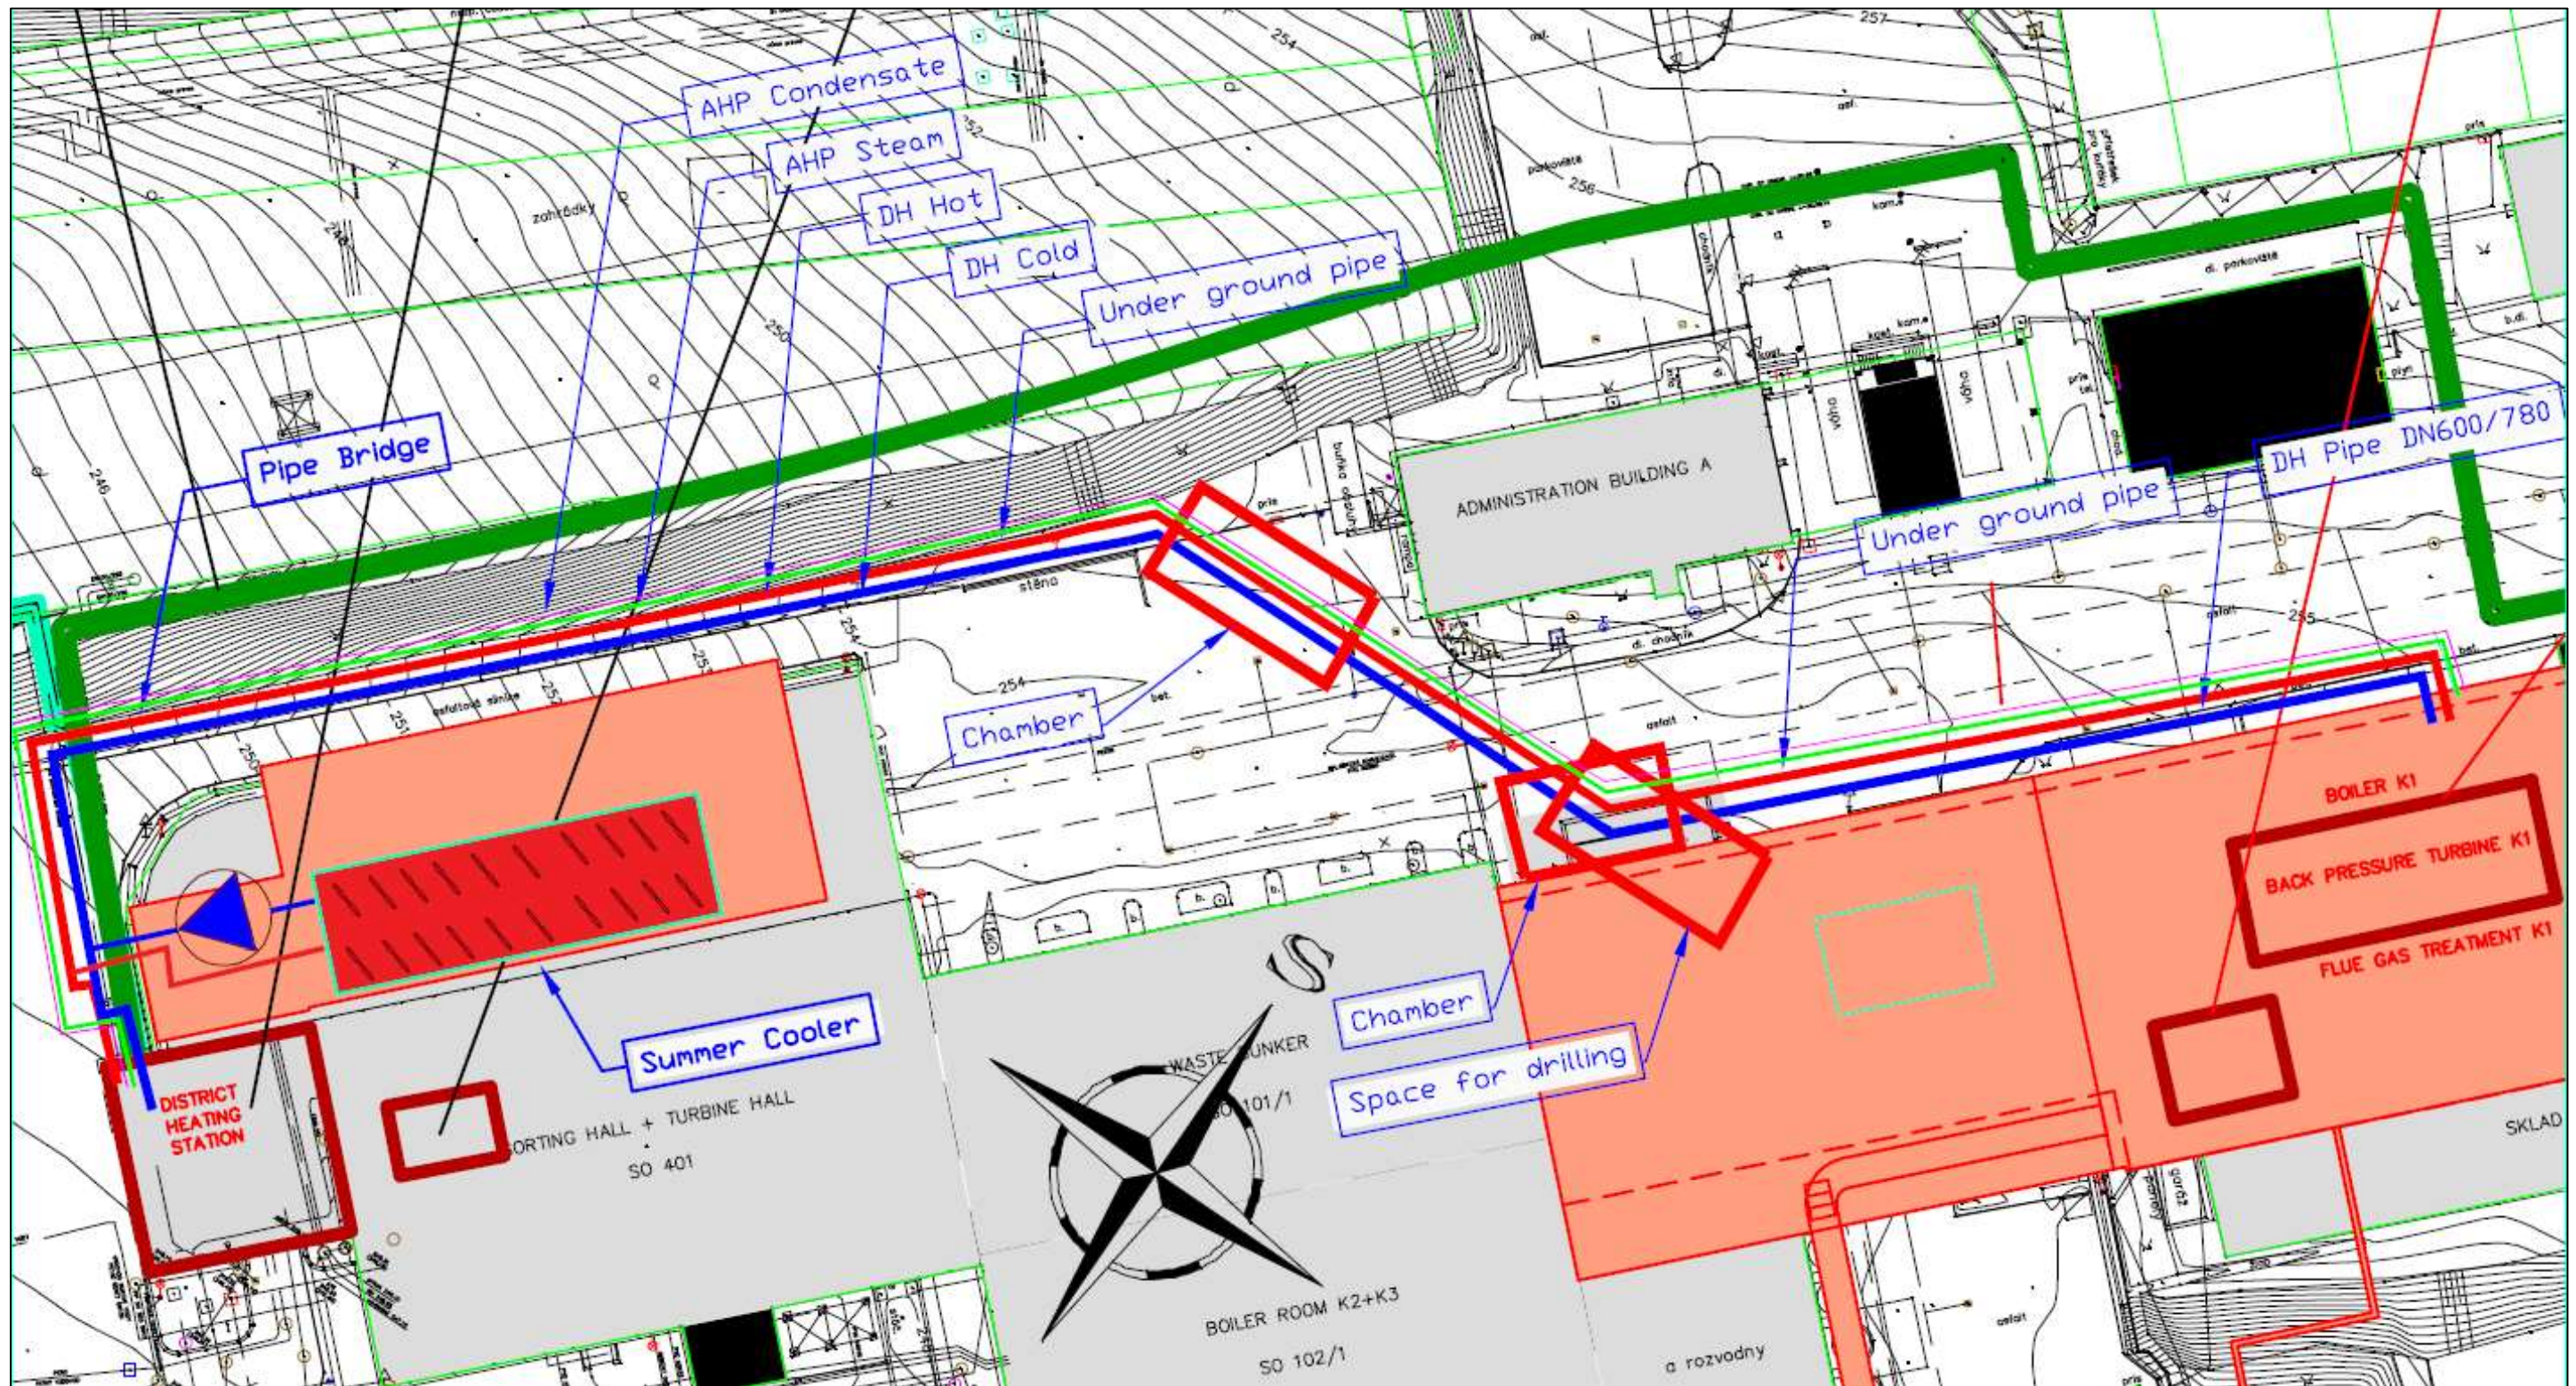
, Alternative B - Pipe routing between K1 and existing DH building. "S" is towards the north.
